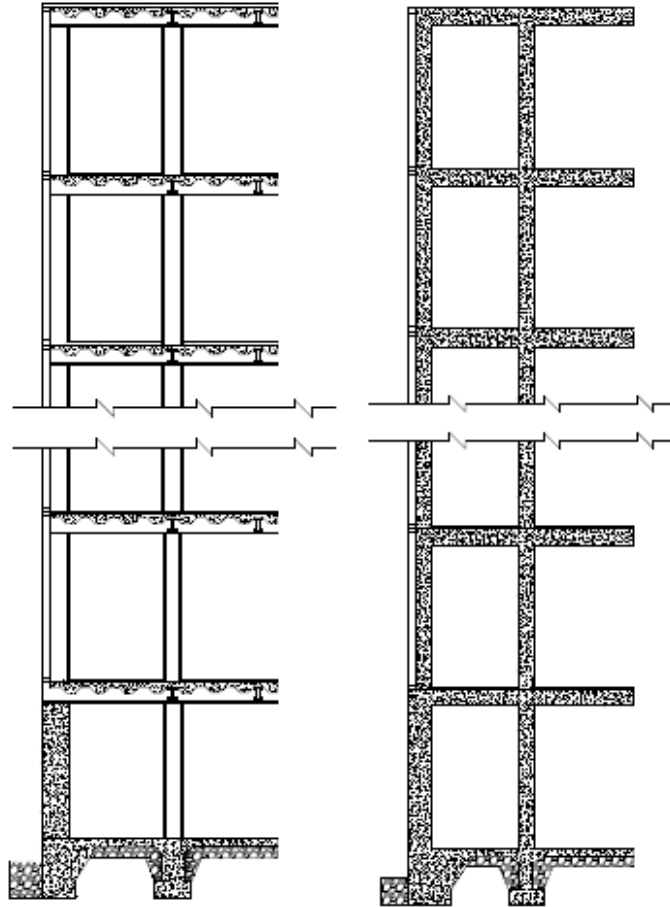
Section of steel (left) and concrete (right) frames. Drawings by Omar Swei.
